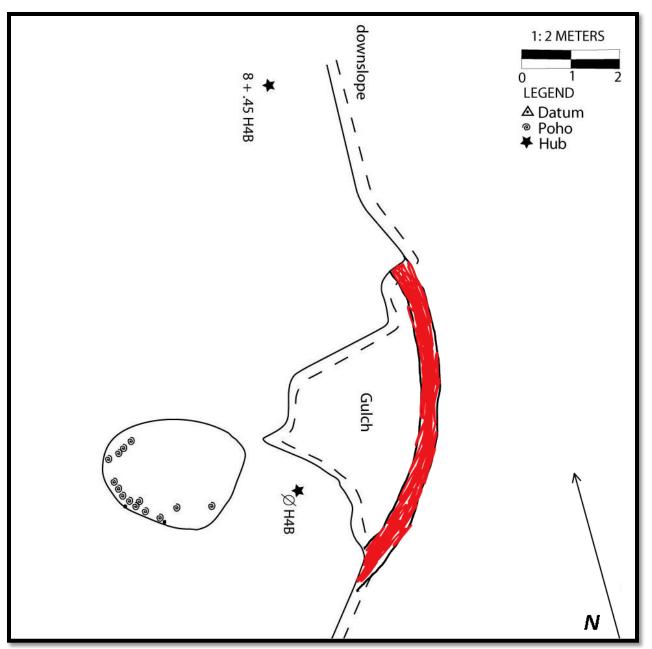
Proposed Stabilization of the area of SITE 50-20-97-110 Feature BU BU.
